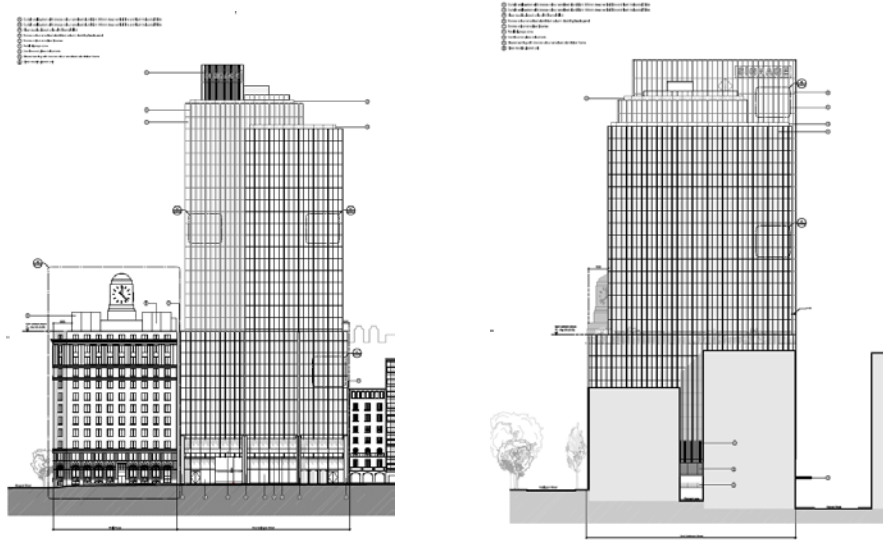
Carrington St (west) and south elevations (Make + Architectus)
